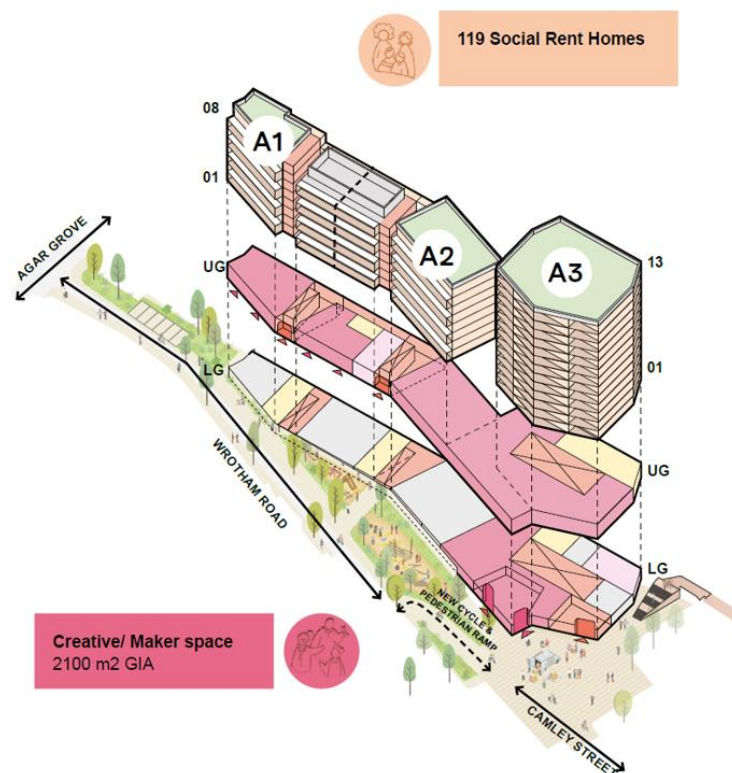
Isometric image of proposed buildings and podium showing land use distribution
